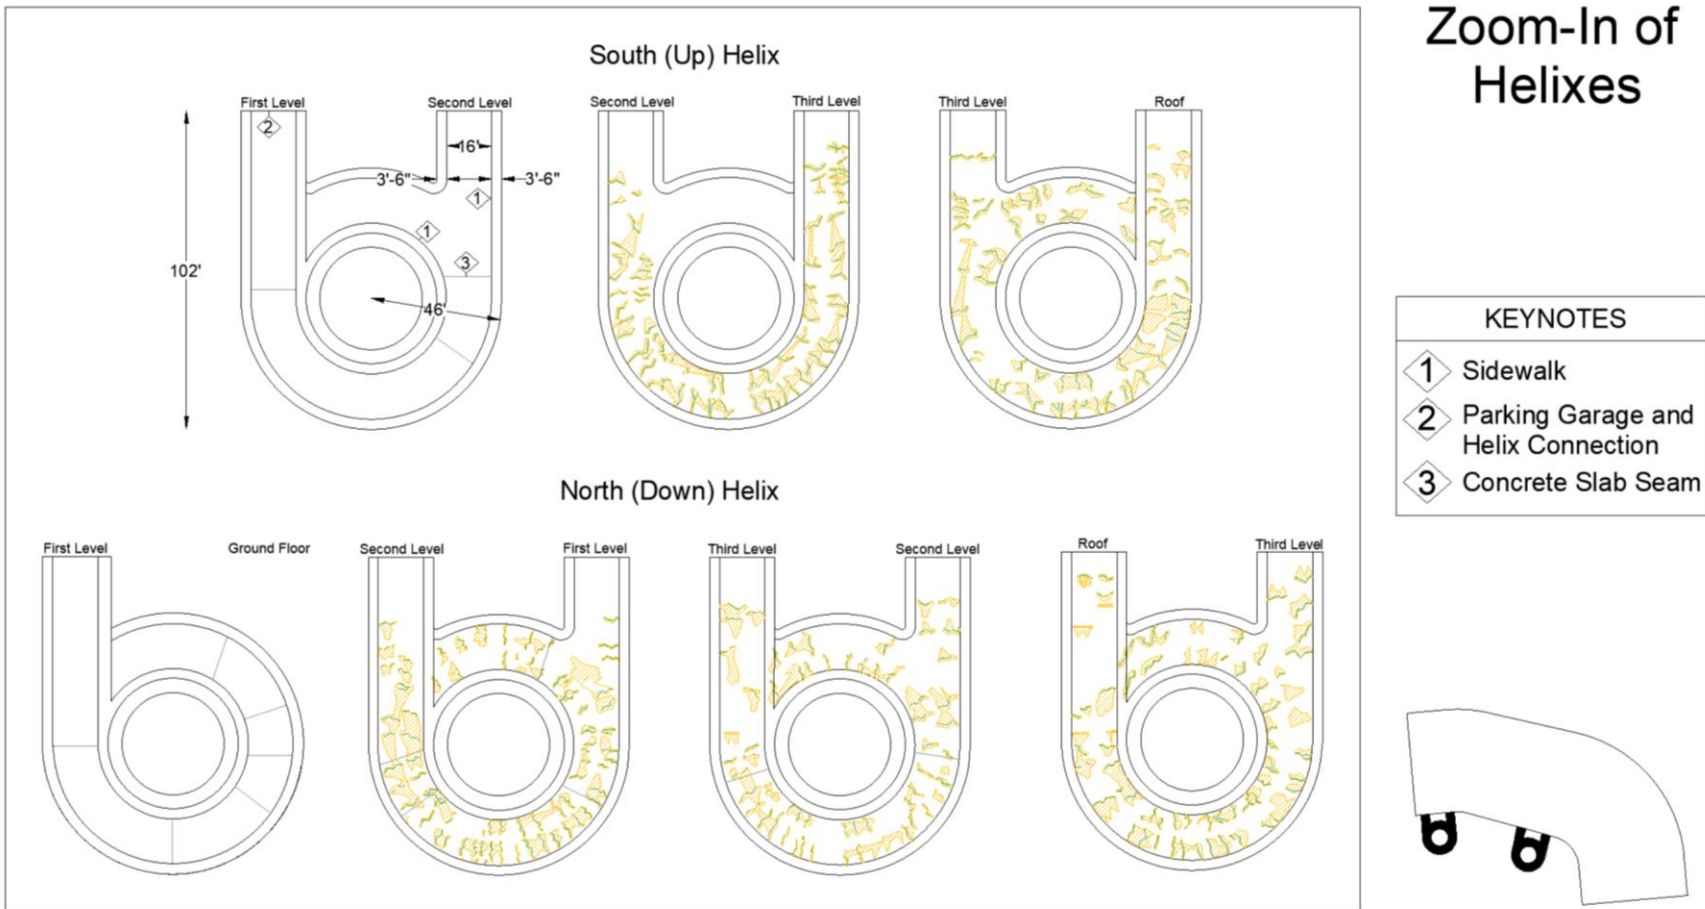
Crack map of the suspended, reinforced silica fume concrete helix ramps with green bottom-up cracks, yellow zones of efflorescence, and gray un-cracked epoxy-filled construction joints.
